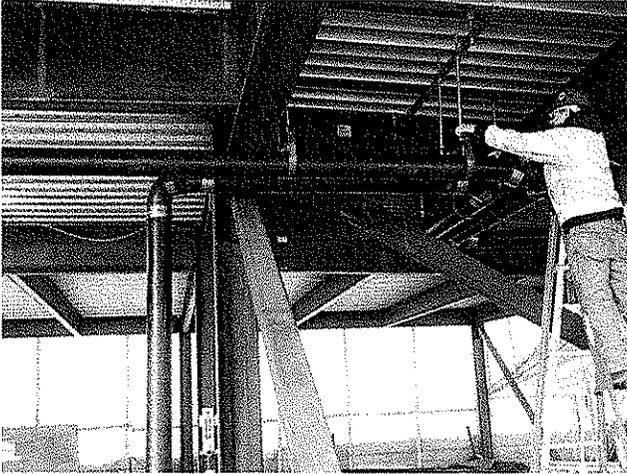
View north on the 3rd floor of building segment E. January 20, 2011.
